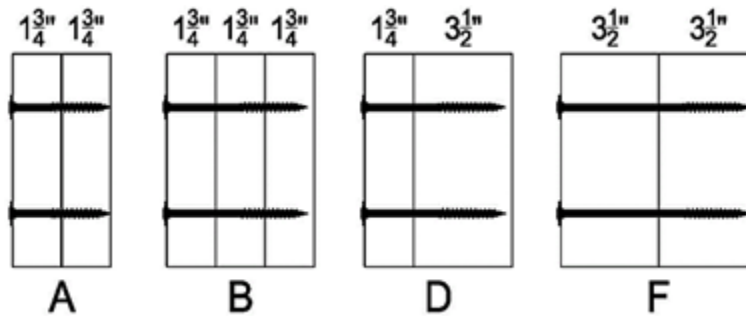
SCL ASSEMBLY CONFIGURATIONS
